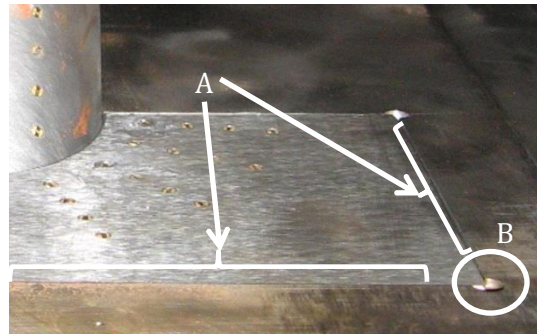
Magnified view of the flat plate prior to testing (from Figure 3-6) showing the recess of the flat plate (A) and manufacturing defect present on the four corners of the flat plate insert (B).
